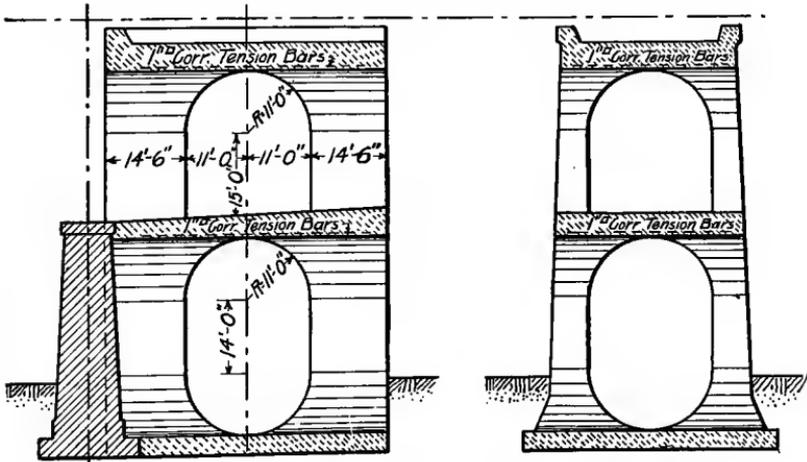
T ABUTMENT WITH TRANSVERSE AND LONGITUDINAL ARCHES.
